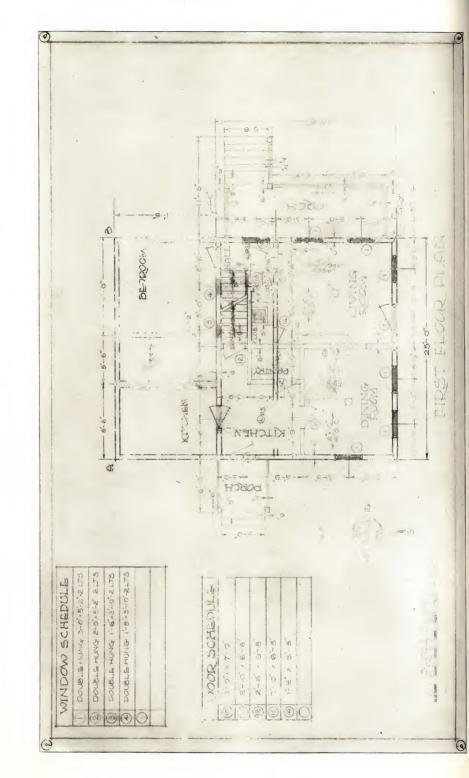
Step 2 in Drawing Remodeling Plans for First Floor
